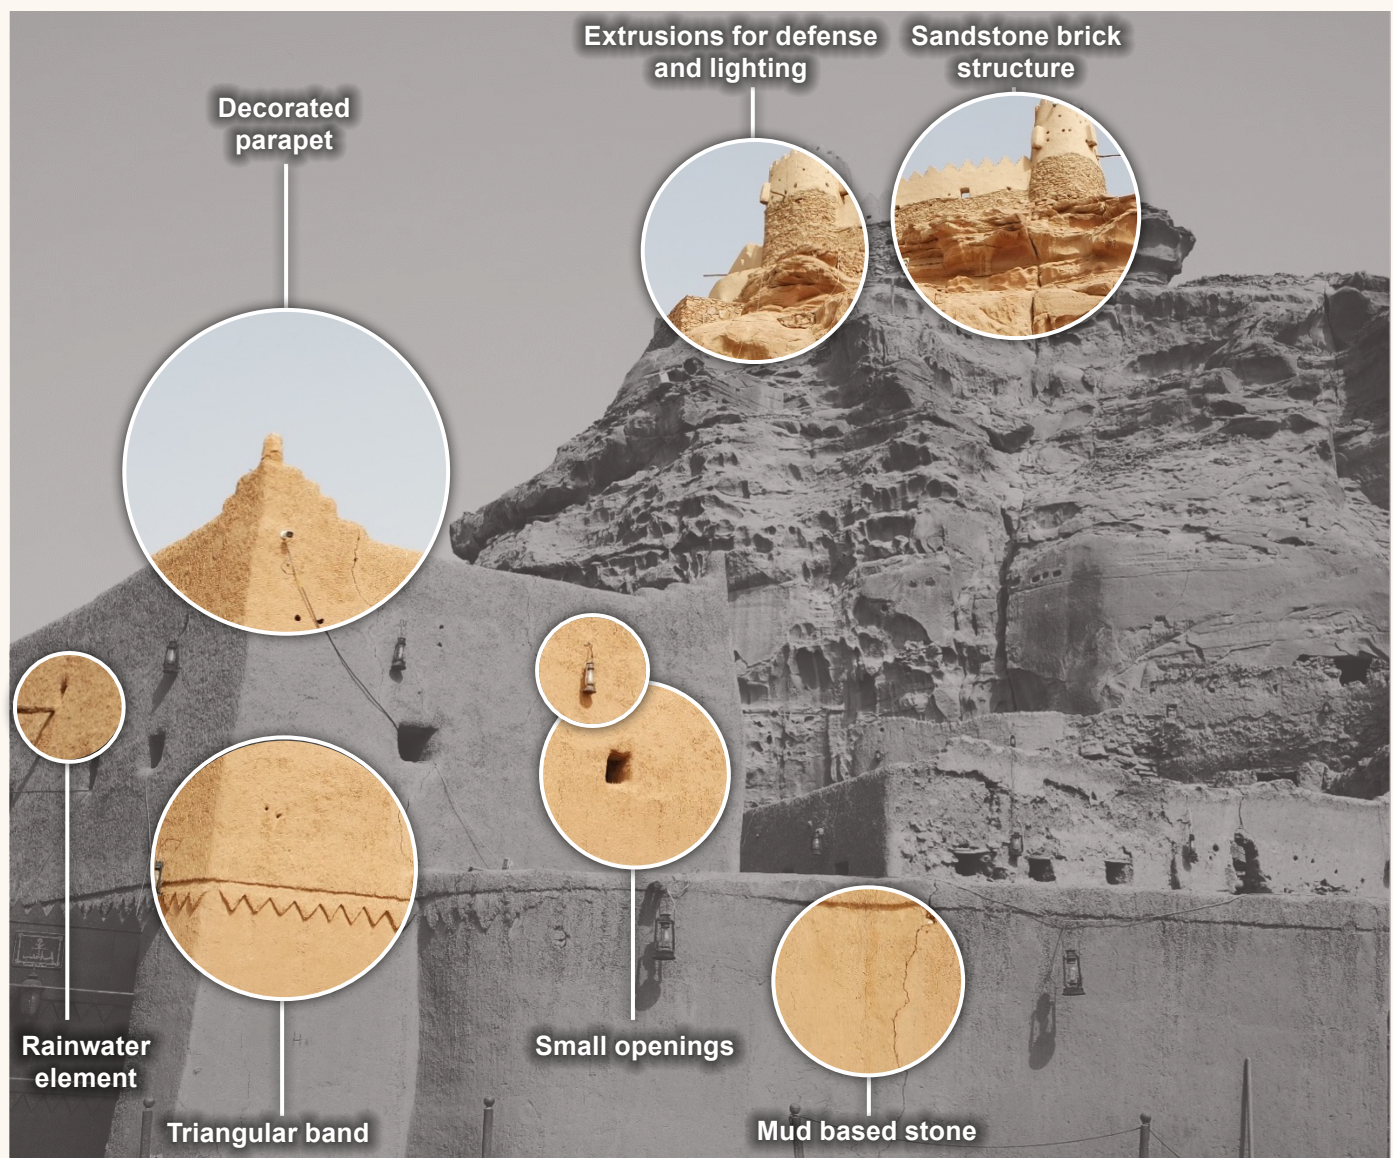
TYPICAL BUILDING FORM, SAKAKA
